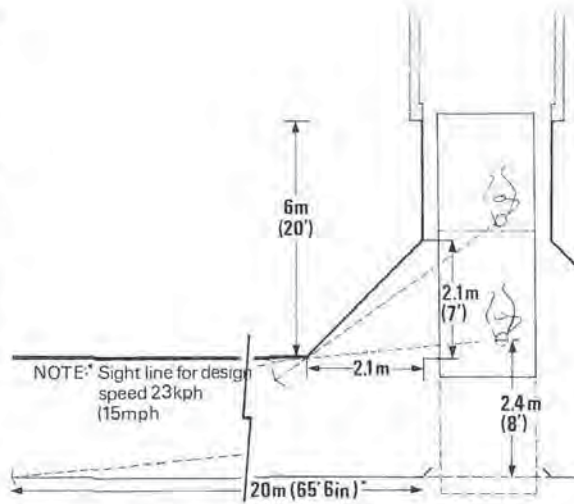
shows the garage and parking space sight splays which will be required.
